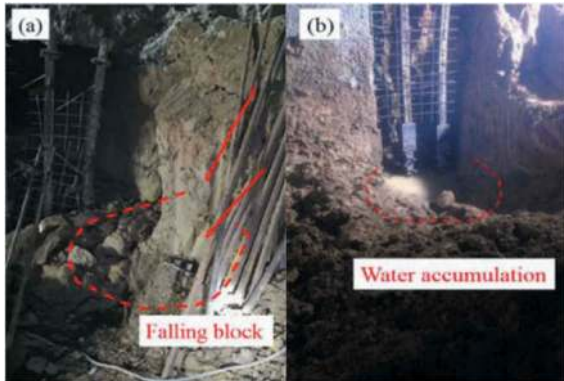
Distresses during tunnel construction (a: Falling block, b: Water accumulation at the tunnel toes).
